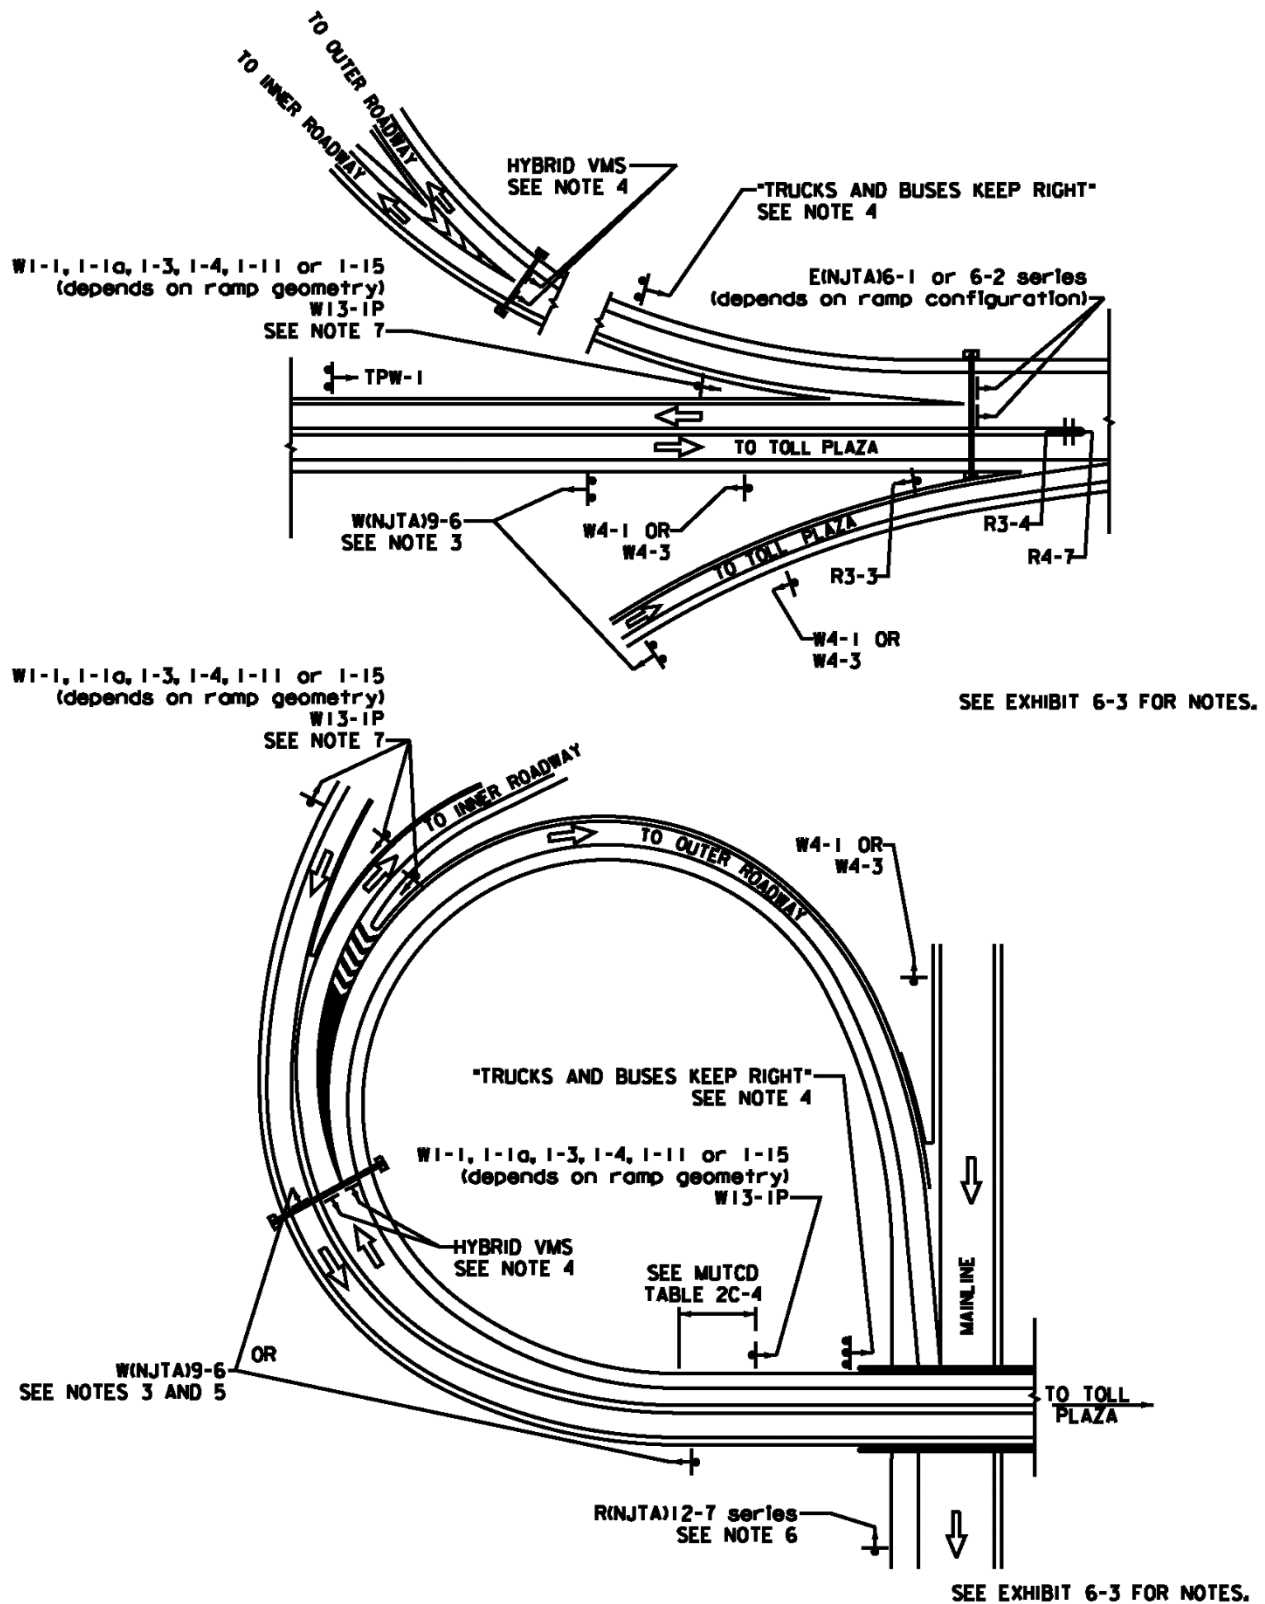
5 – SIGN LOCATION PLAN – EXIT RAMP
